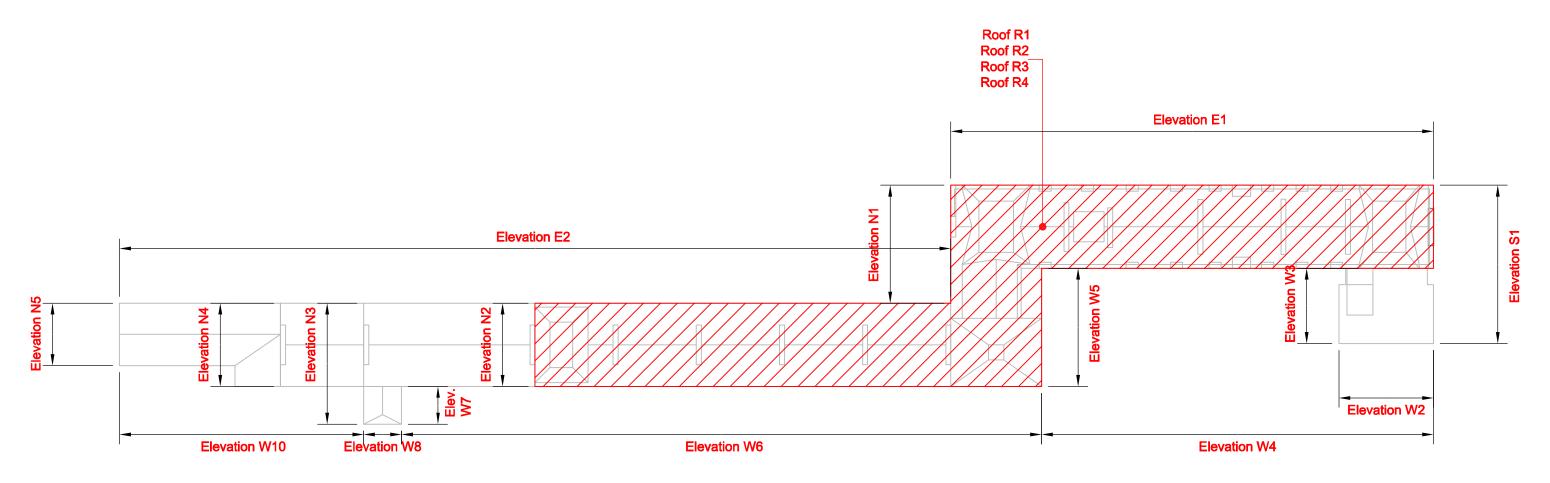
Plan of Station Hotel Building showing Roof and Elevation Location References
